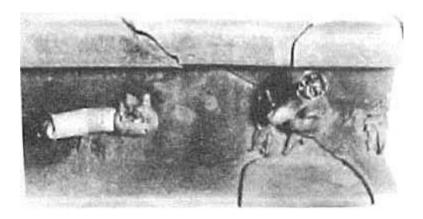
481 - WELDING, TRACTION BOND WELDING CRACK AT WELD
